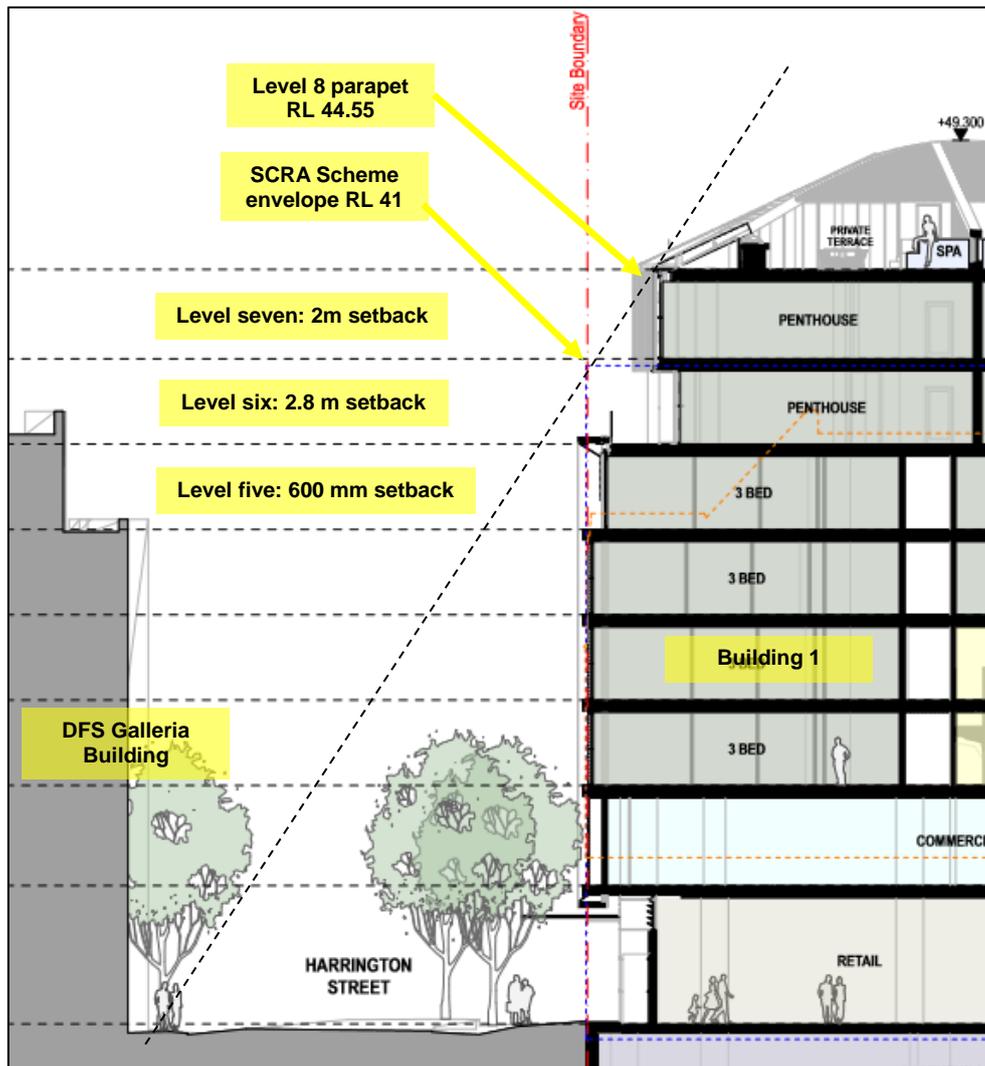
Cross-section of Building 1 to Harrington Street (Source: Architectural Plans)
